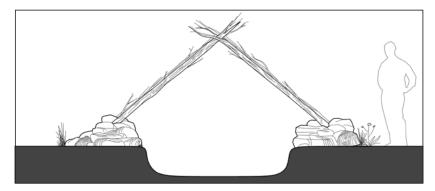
Hypothetical reconstruction of the building. – (Drawing U. Kraśniewska).
